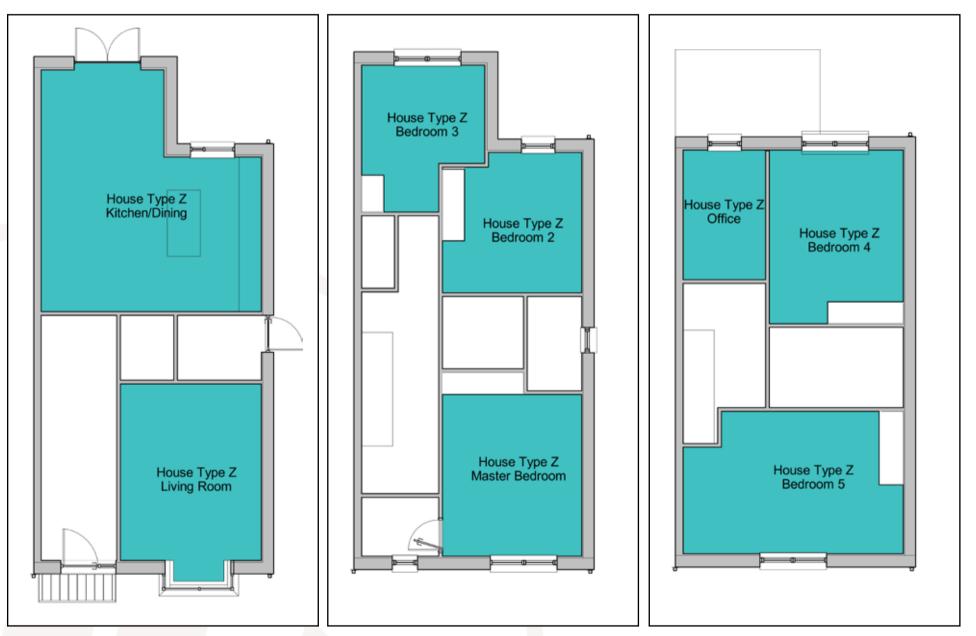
Floor plans of the assessed house type. Ground Floor (L), 1st Floor (C), 2nd Floor (L).
